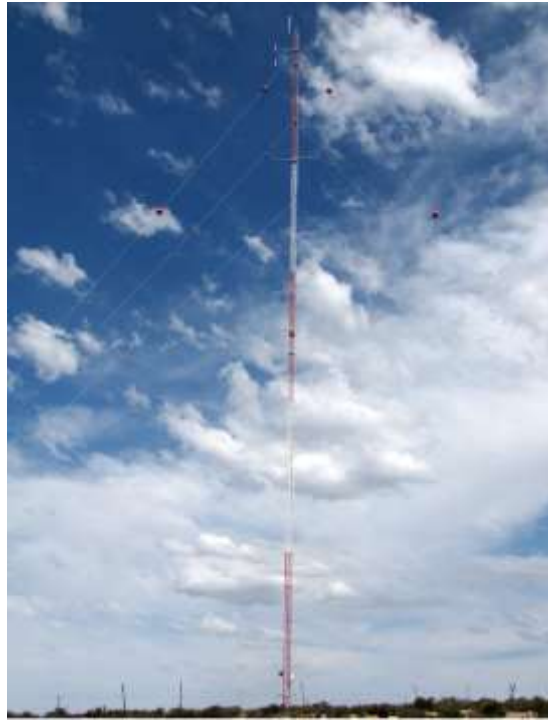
AN INSTALLED STEEL GUYED LATTICE MAST
